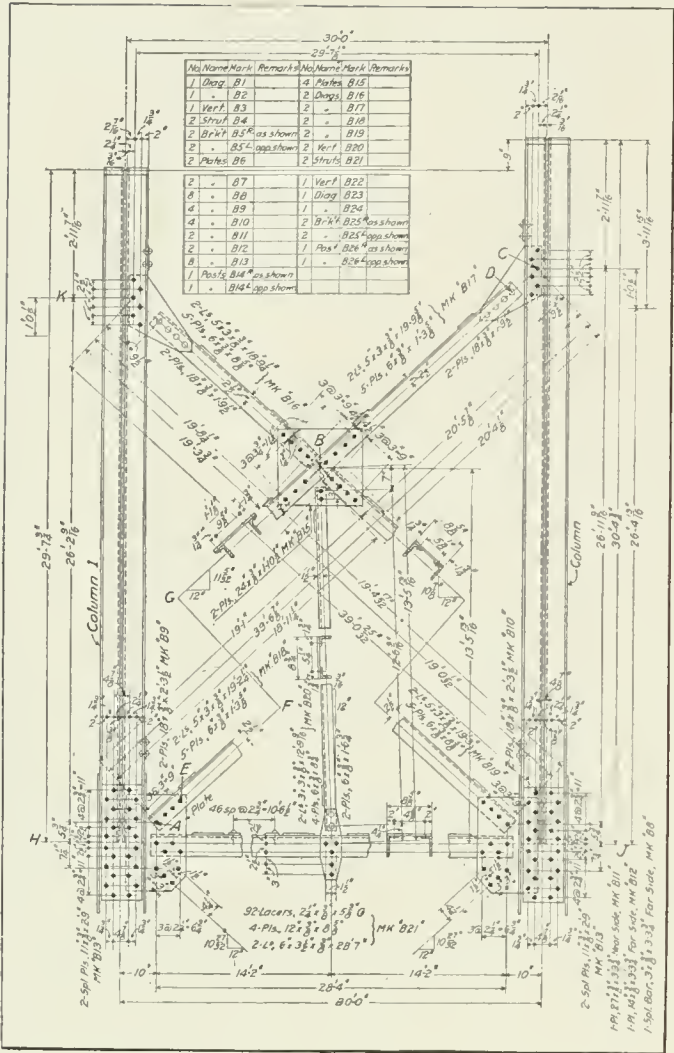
Complete Shop Drawing of Trestle for Supporting Pipe Work
